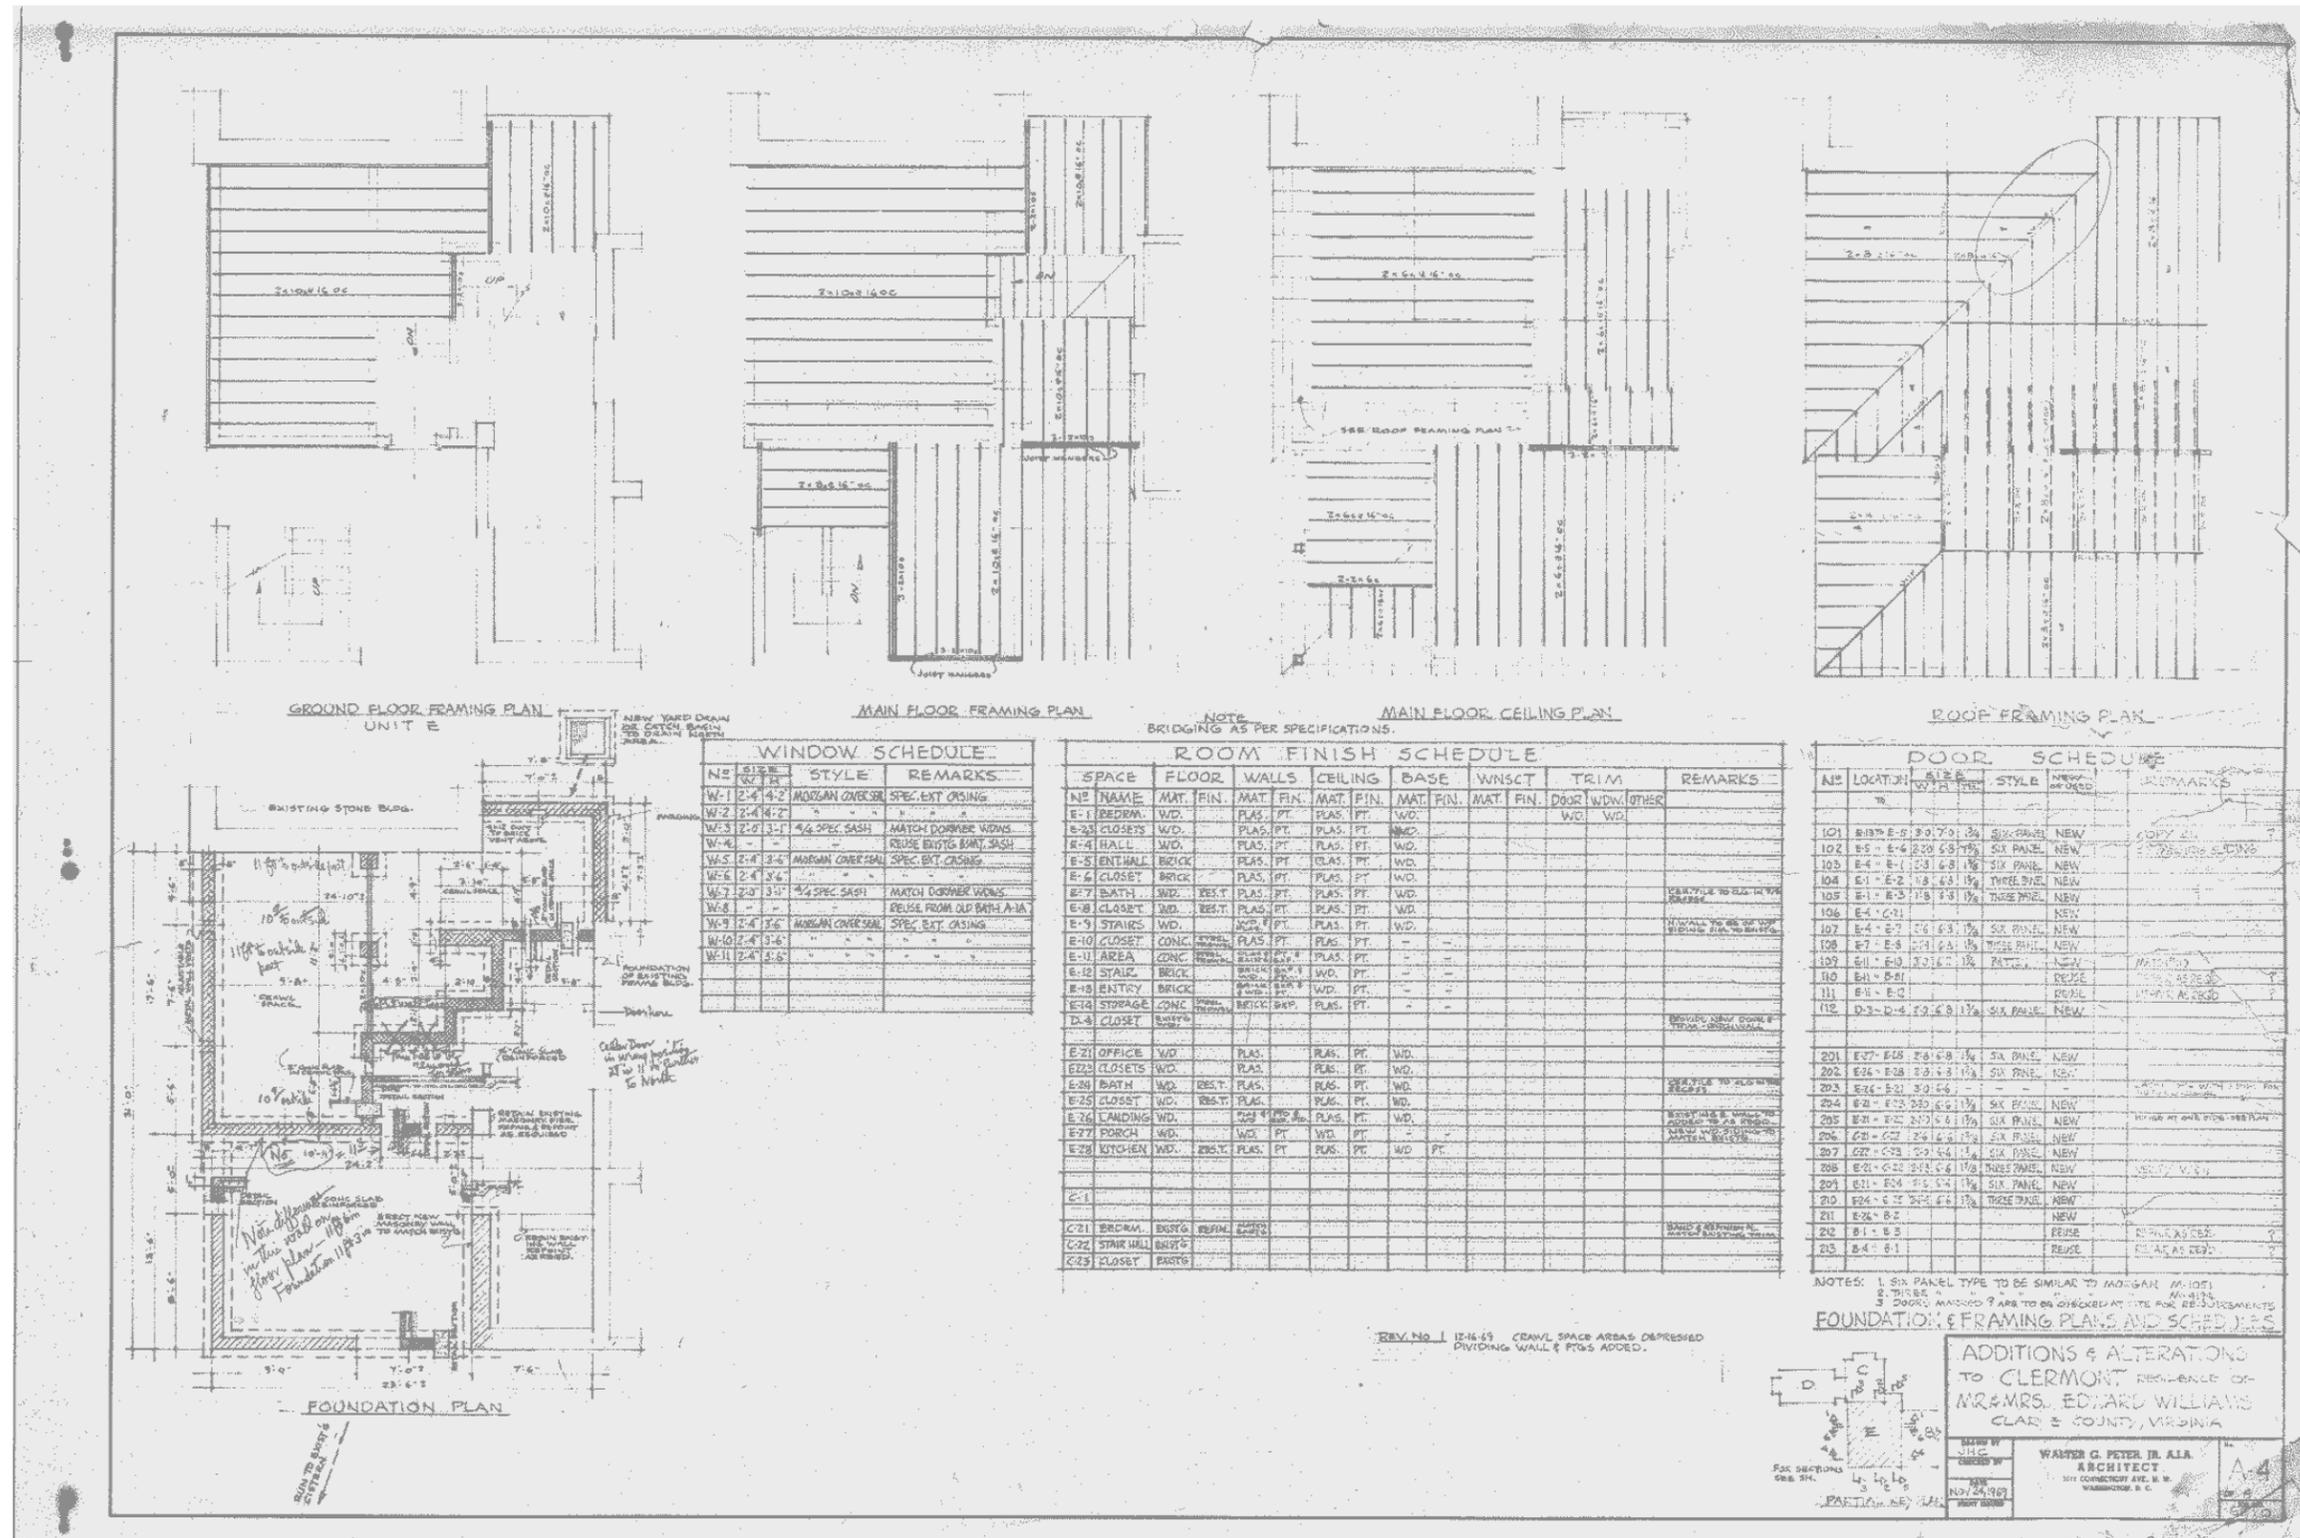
Foundation plan, framing plans and schedules of the 1969 additions and alterations construction drawings (not to scale).
